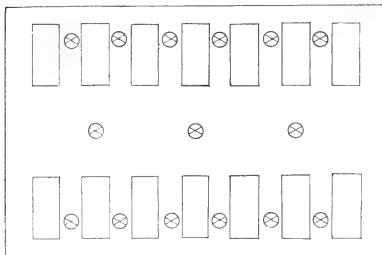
TYPICAL SOLE-CUTTING-ROOM LAYOUT.
